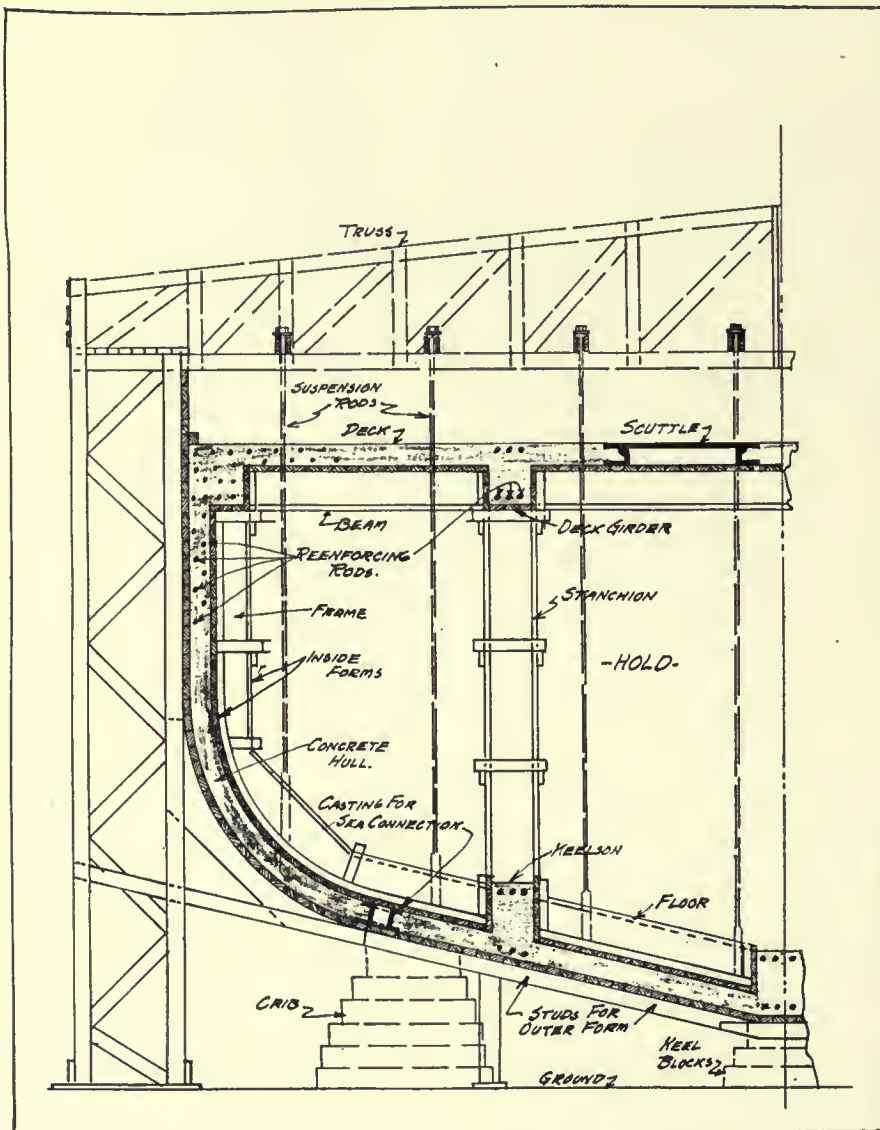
TYPICAL SECTION OF A CONCRETE HULL UNDER CONSTRUCTION
